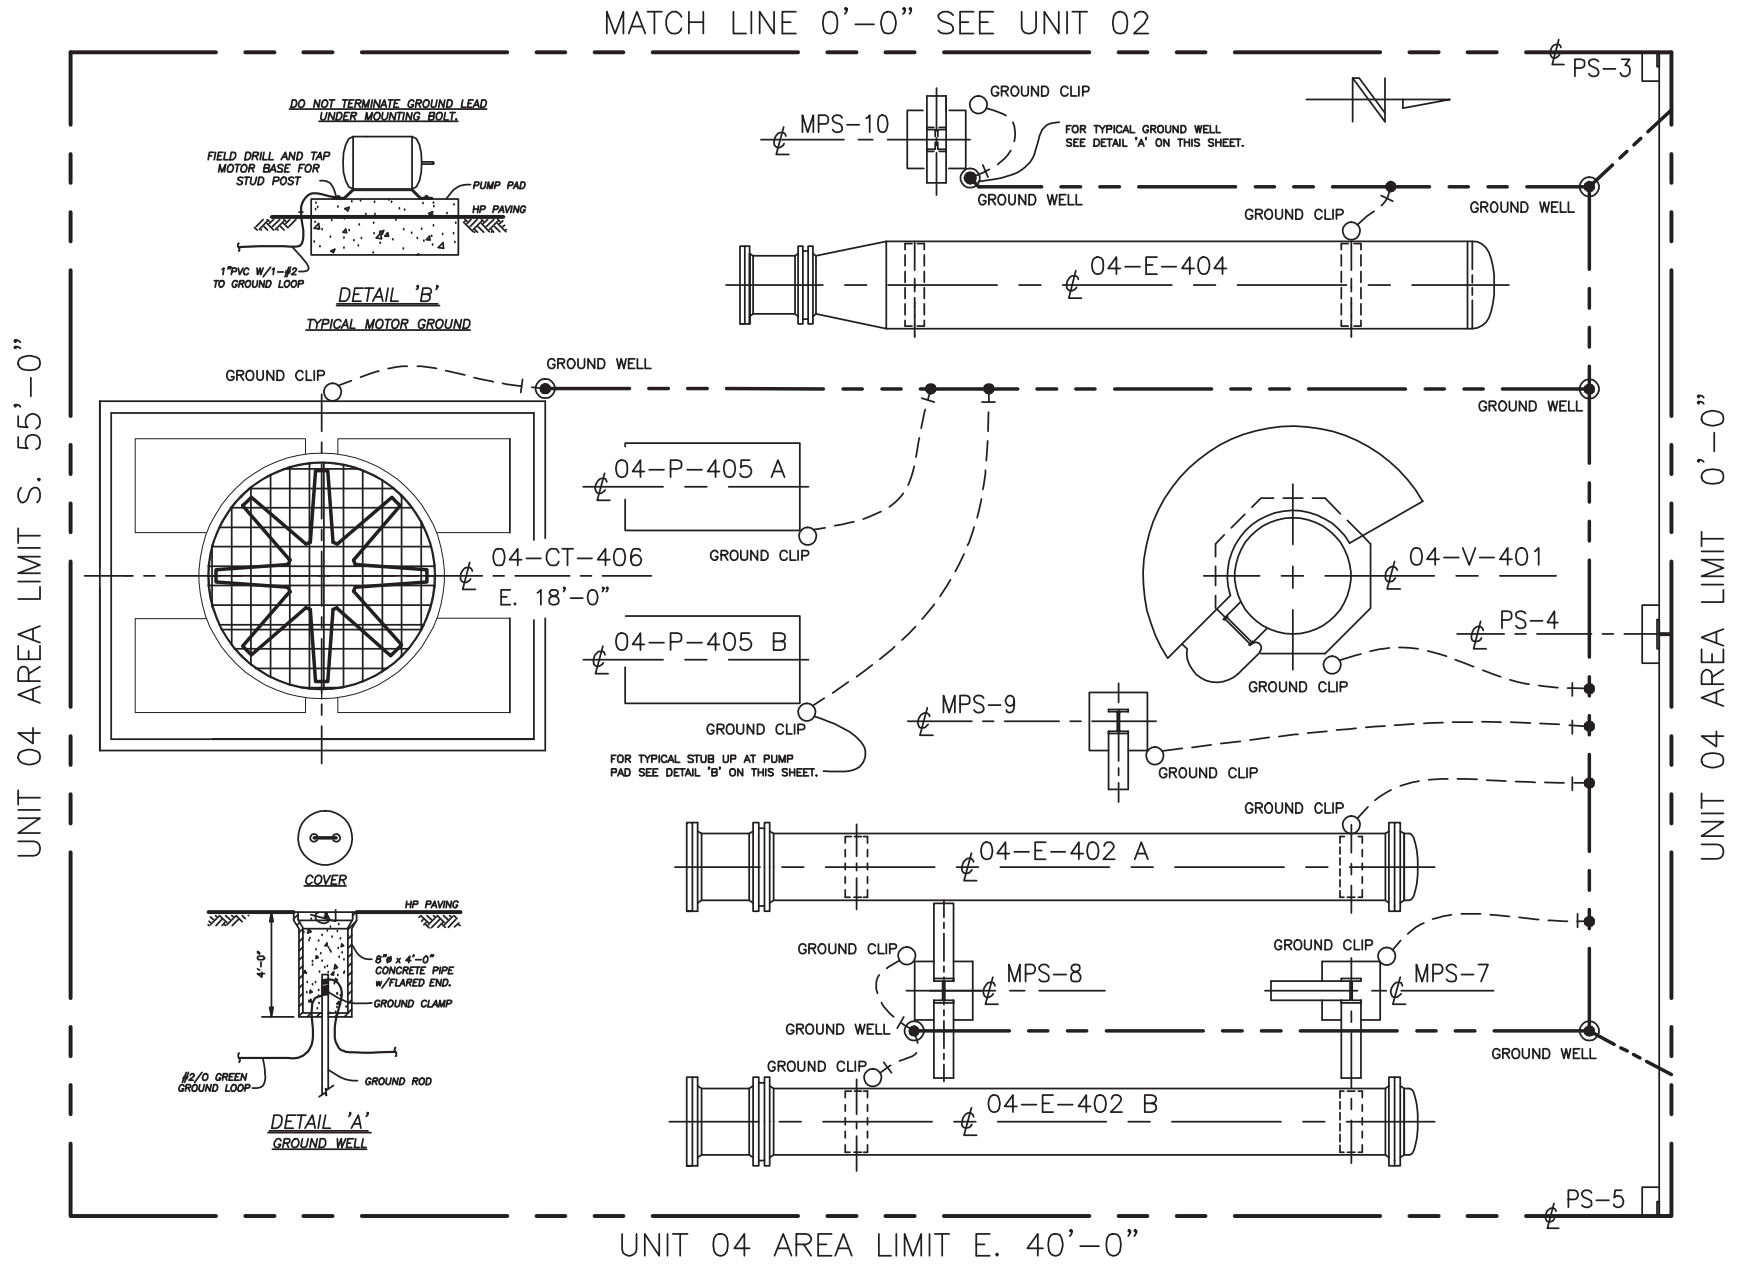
Unit-04: Electrical: Grounding Plan.
